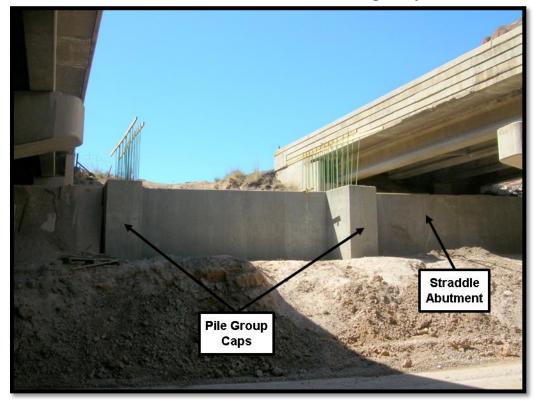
Straddle Abutment on the I-80 Echo Road Bridge Project, Utah
